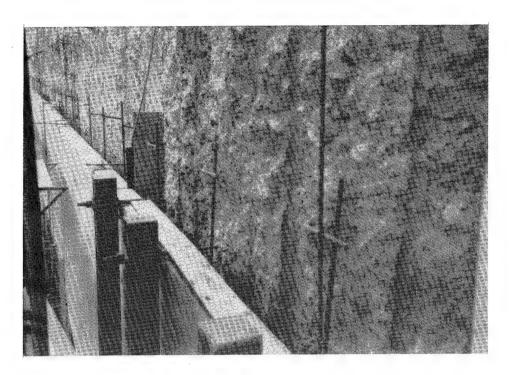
Top of precast panel prior to placing infill concrete, Troy Lock (from Miles 1993)
